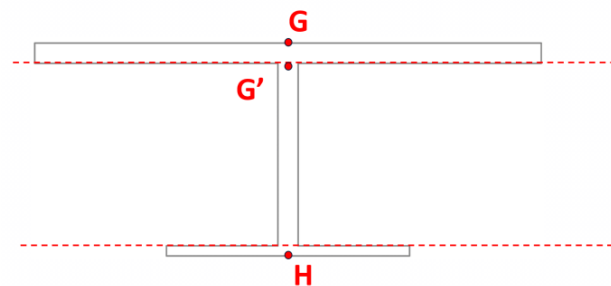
Labelled points of interest on the cross-sectional view of the girder
